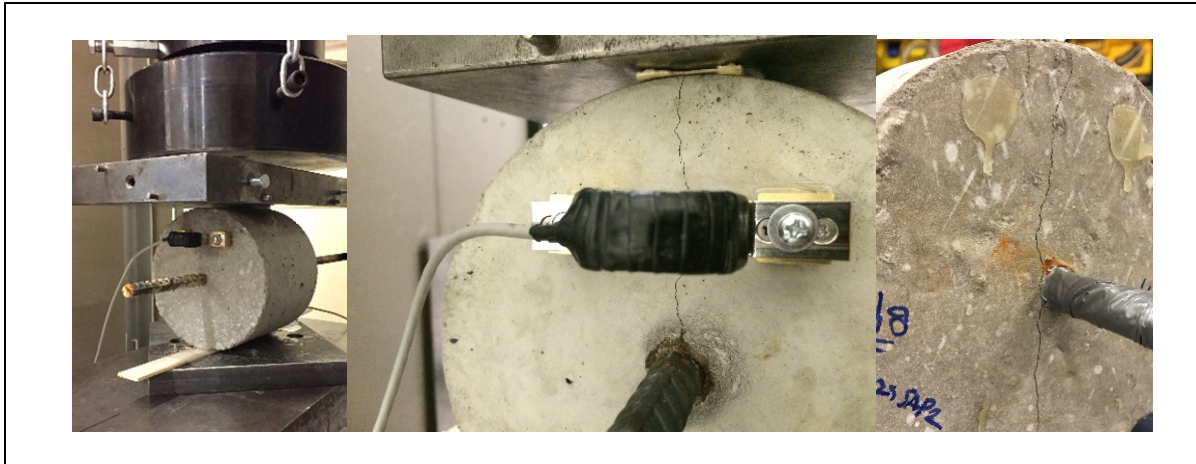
Induced cracks at rebar-concrete interface by controlled splitting test
